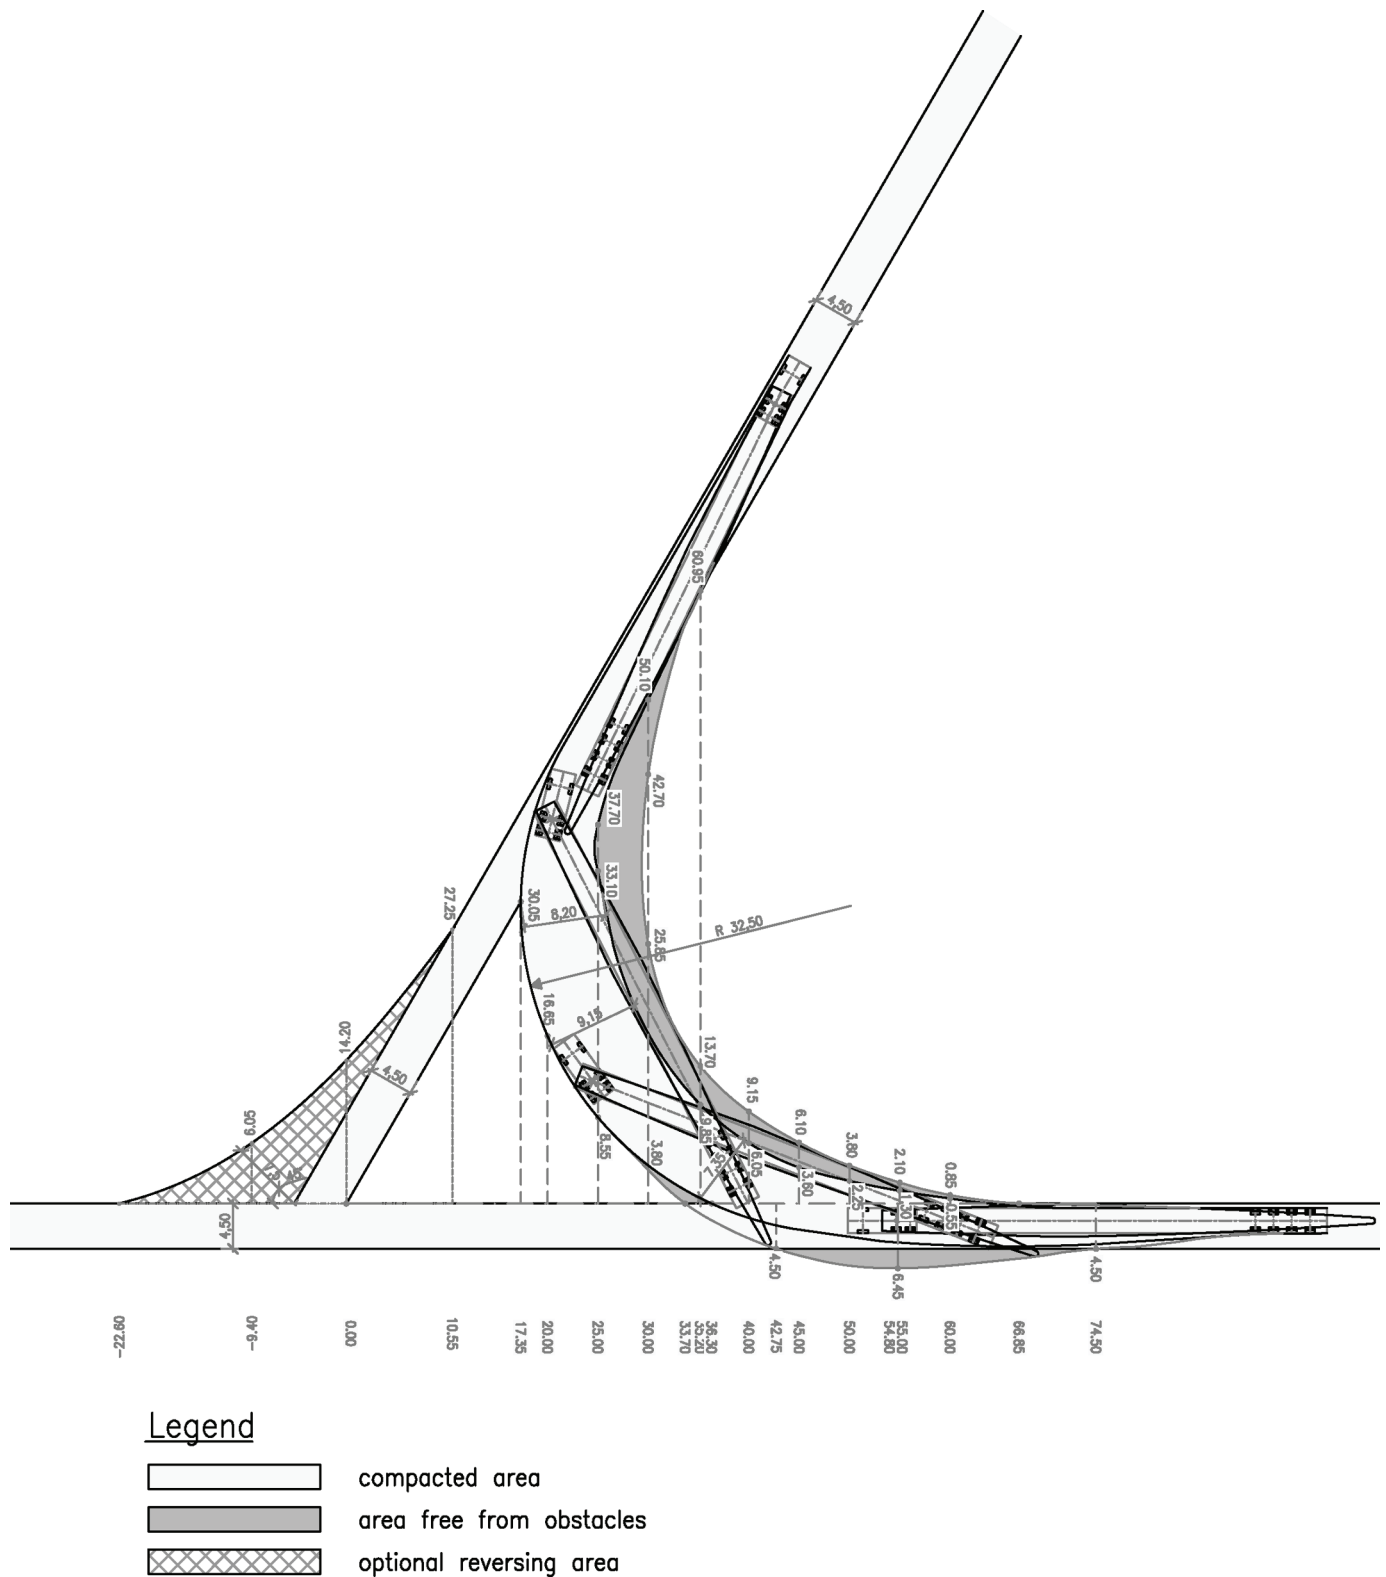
Truck with rear axle steering, outside radius 32.5m / turning angle 120°
